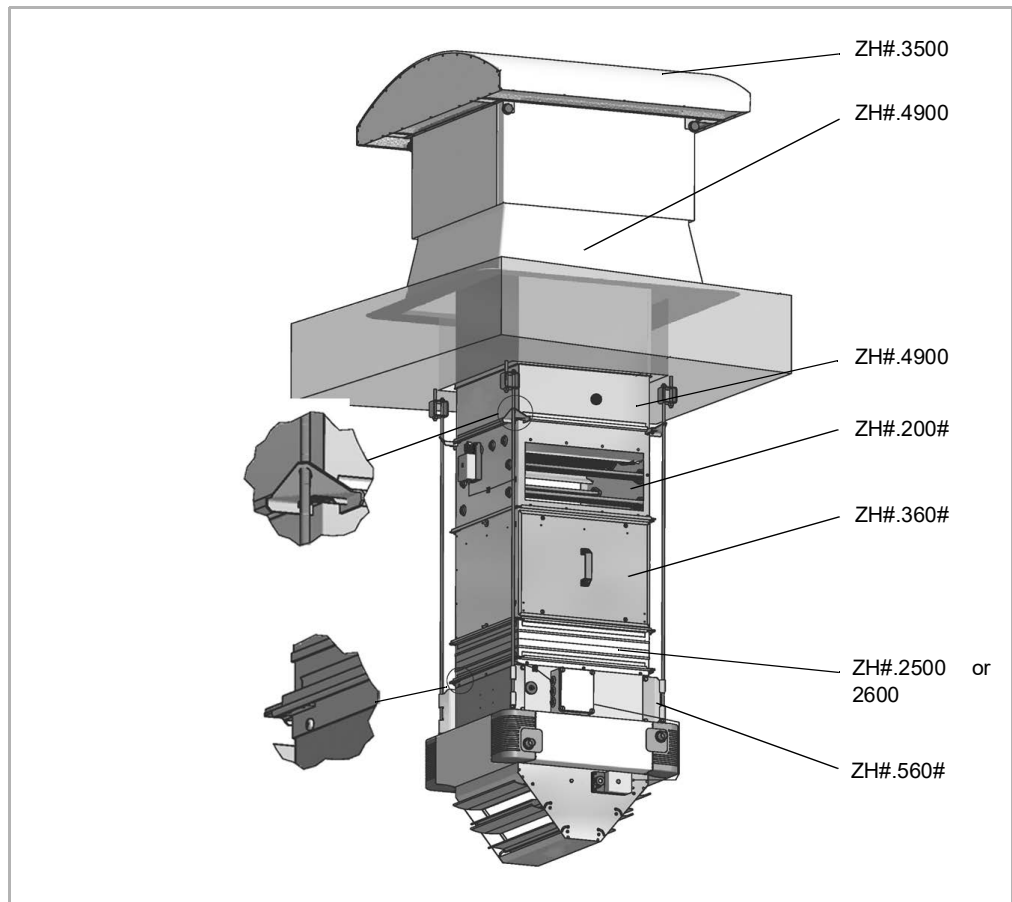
Ceiling mounting of an air mixing unit and accessories with a ceiling suspension bracket (ZH#.560#)
